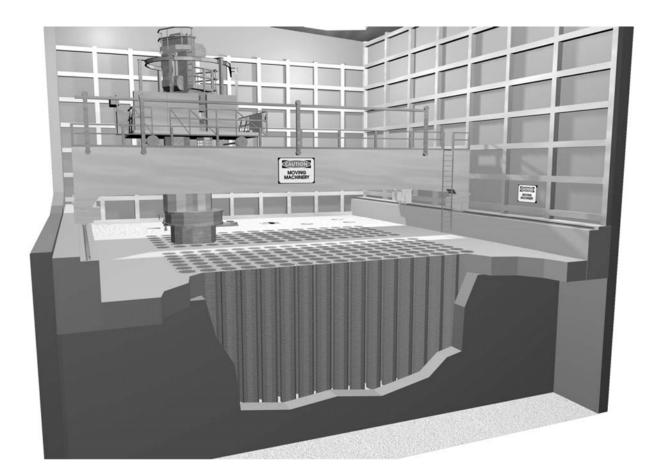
Schematic Storage Vault Configuration for the Proposed Idaho Spent Fuel Facility (Modified from FWENC, 2003b) SNF loading operations. Each storage tube would provide interim storage for a single container. A canister-handling machine would move the individual containers from the Transfer Tunnel to the storage tube location. After the container is lowered into a storage tube, the storage tube would be sealed with a cover plate with dual metallic seals, and the air would be evacuated. The storage tubes would then be filled with an inert gas to further reduce the potential of corrosion during storage.
